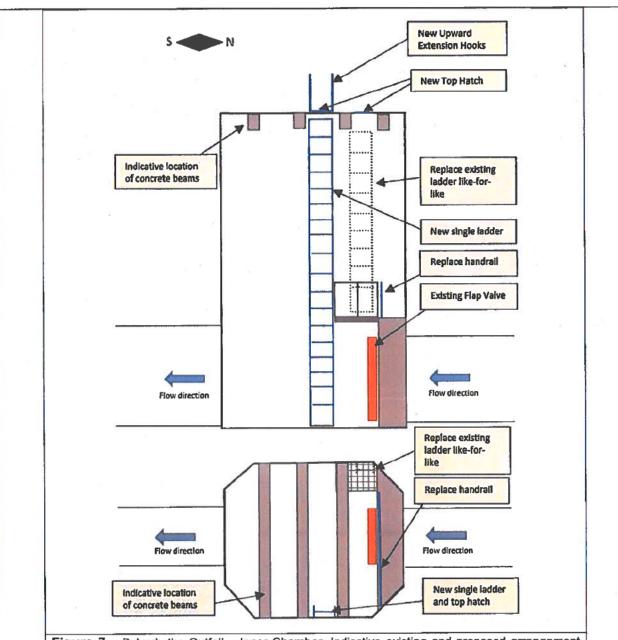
Bulverhythe Outfall – Inner Chamber. Indicative existing and proposed arrangement sketch (cross section and plan view).
